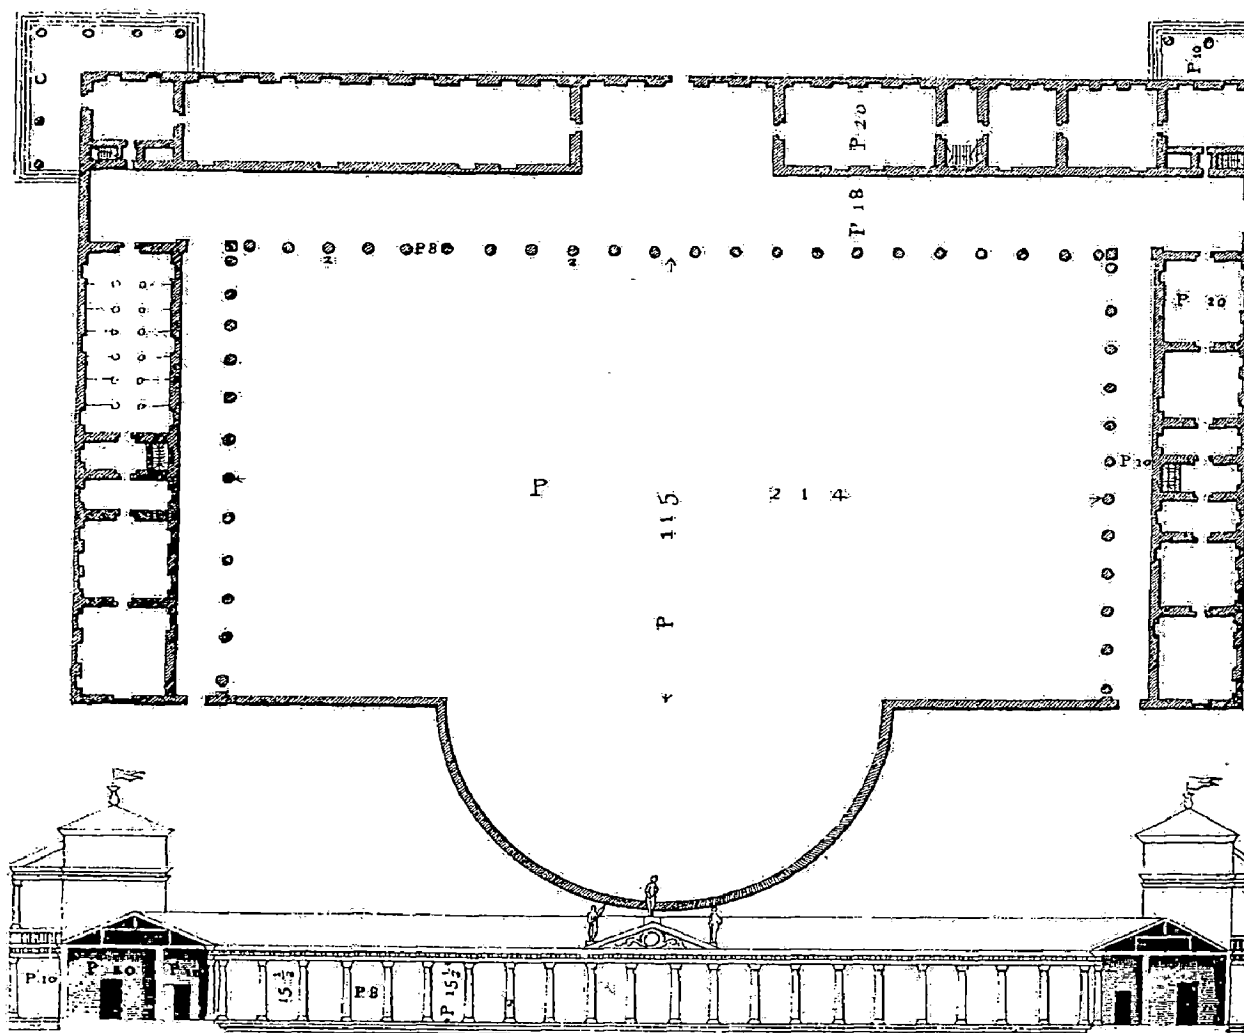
Villa Mario Repeta at Campiglia in plan and elevation
